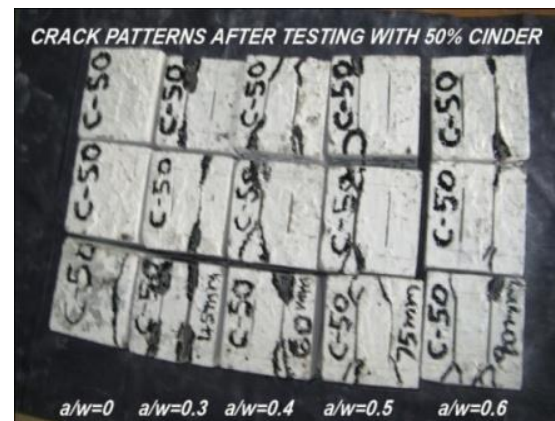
VIEW SHOWS THE CRACK PATTERNS AFTER TESTING OF C-50 SPECIMENS
